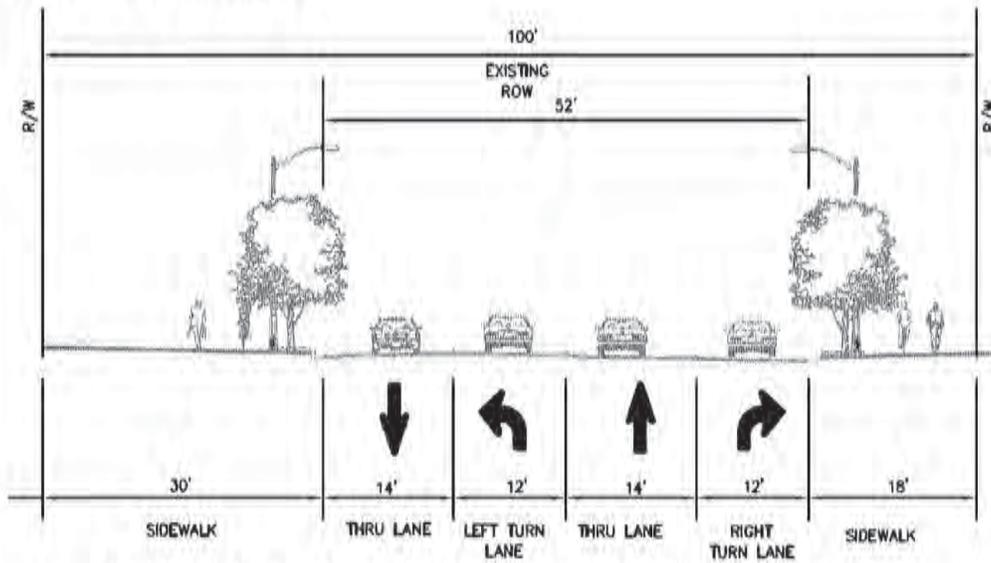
Proposed Cross Section, 3rd Avenue At Signalized Intersections
